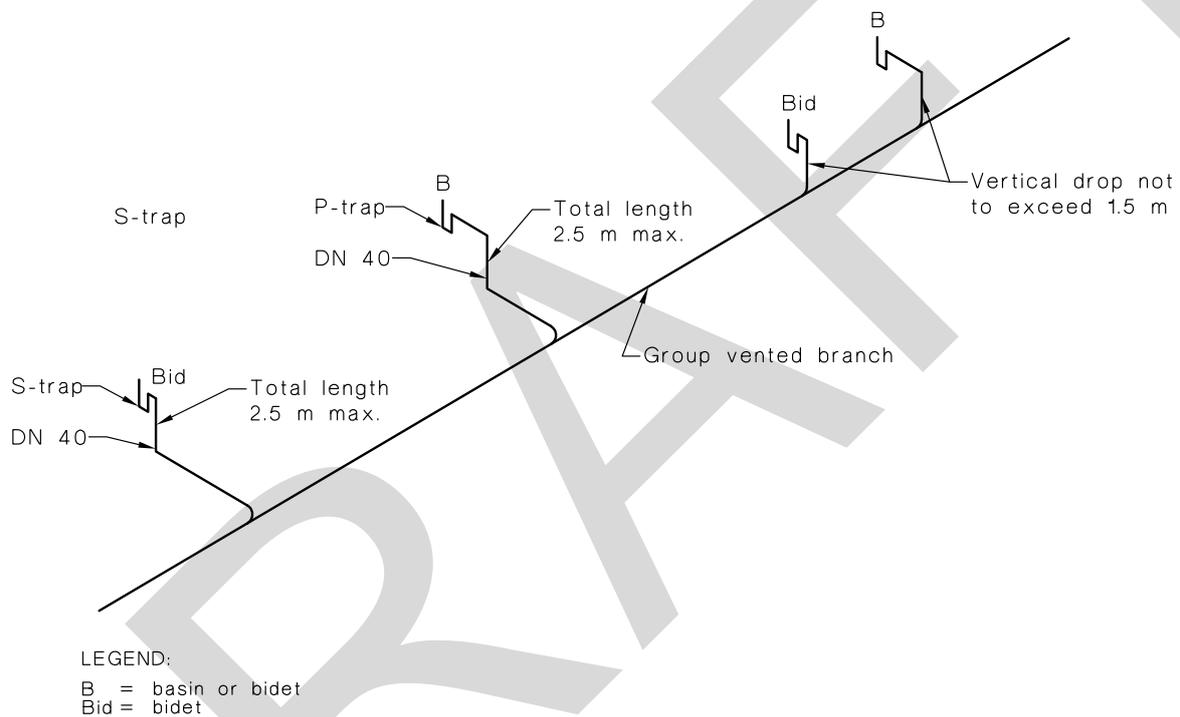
TYPICAL CONNECTION OF BASIN OR BIDET TO A GROUP-VENTED BRANCH
